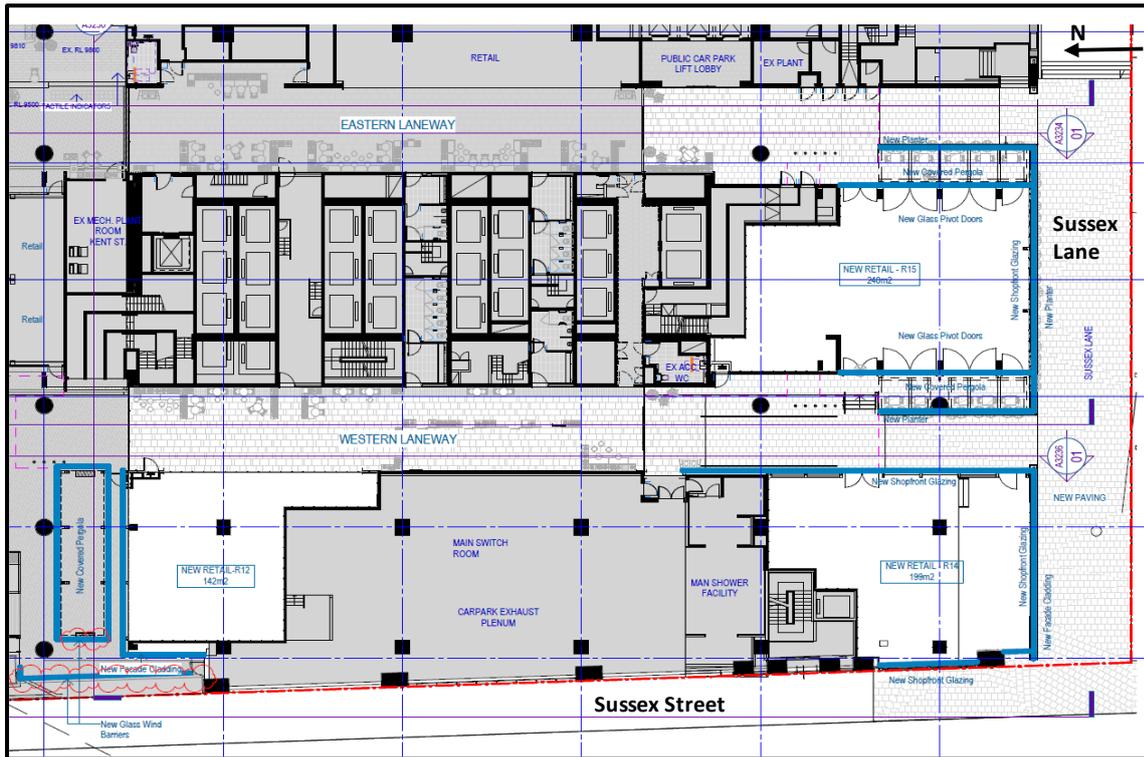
Proposed works - Urban Park Level (floor level above Sussex Street).
